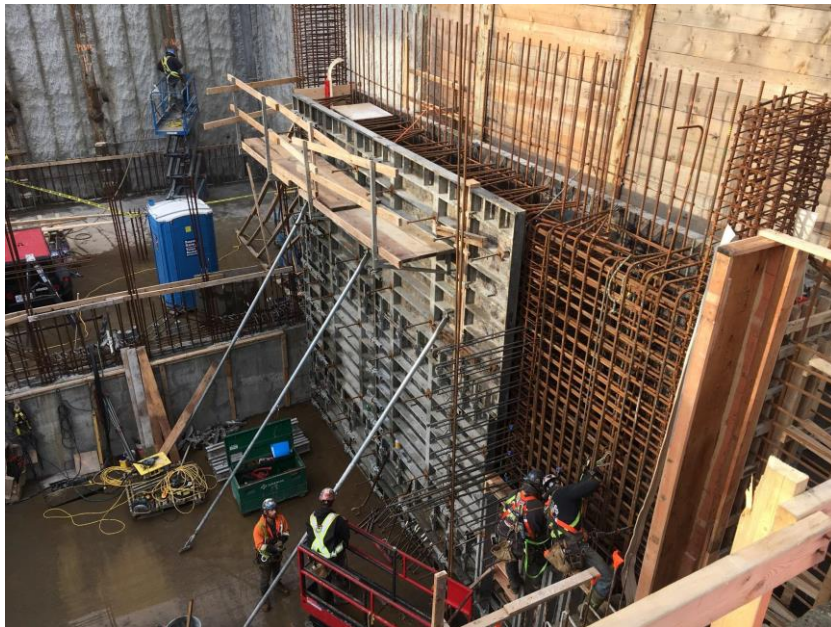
Clover Point Pump Station: closing forms on storm wet well wall.
